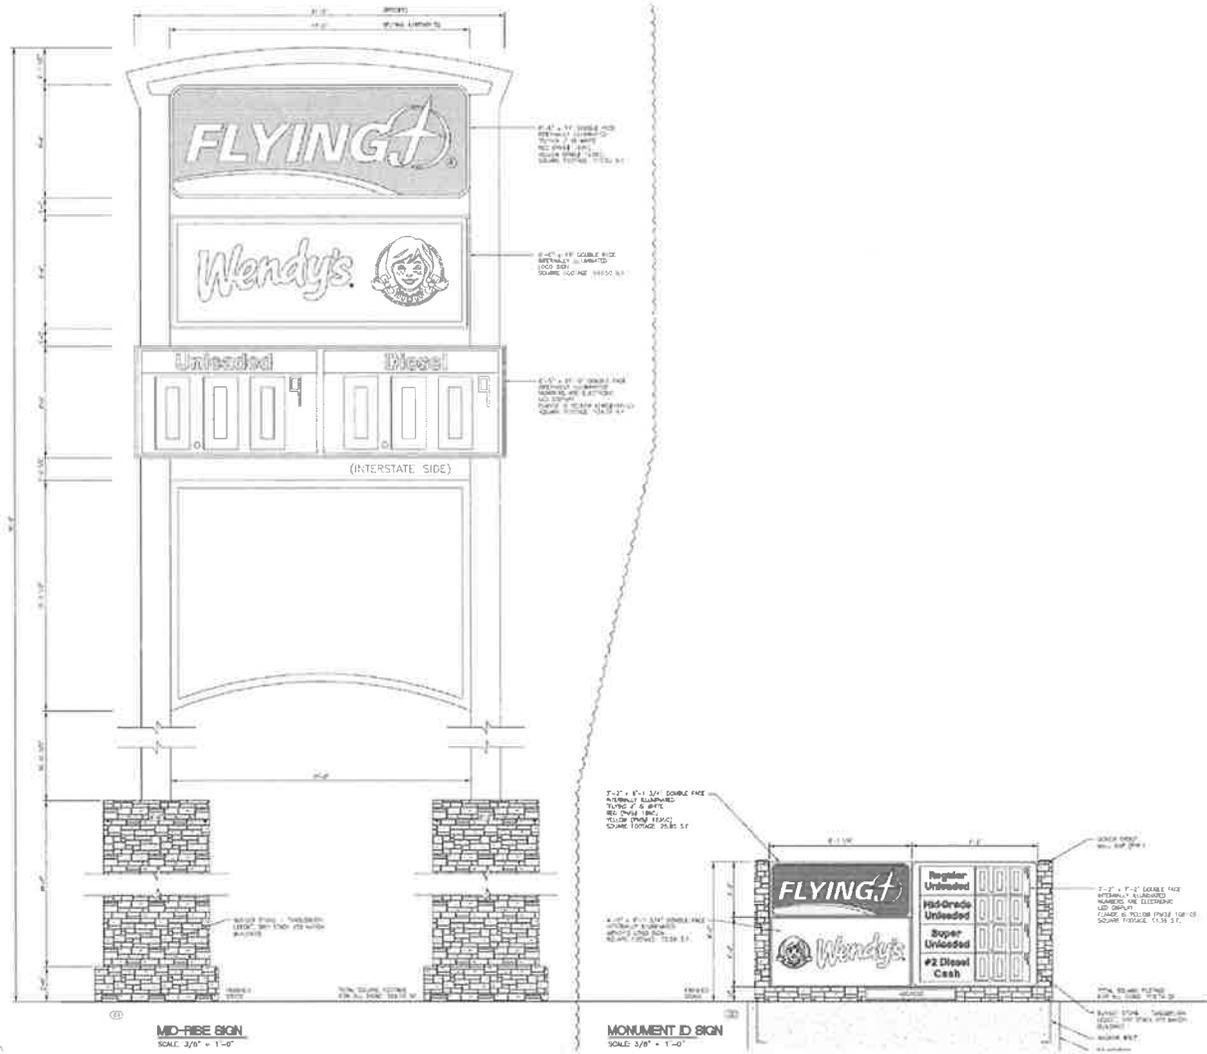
Proposed Signs for Travel Center Building, Side Elevations
